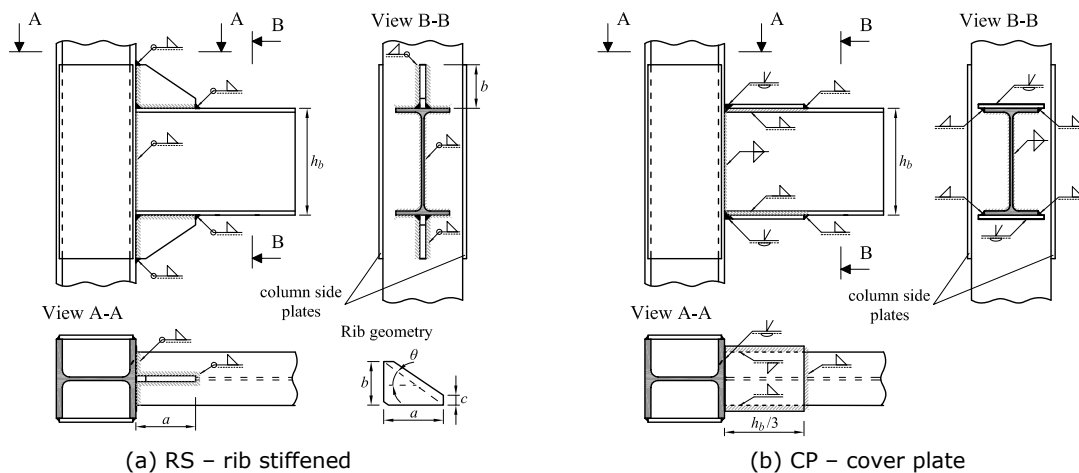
Welded RS and CP beam-to-column joint details (concrete encasement is not illustrated)
